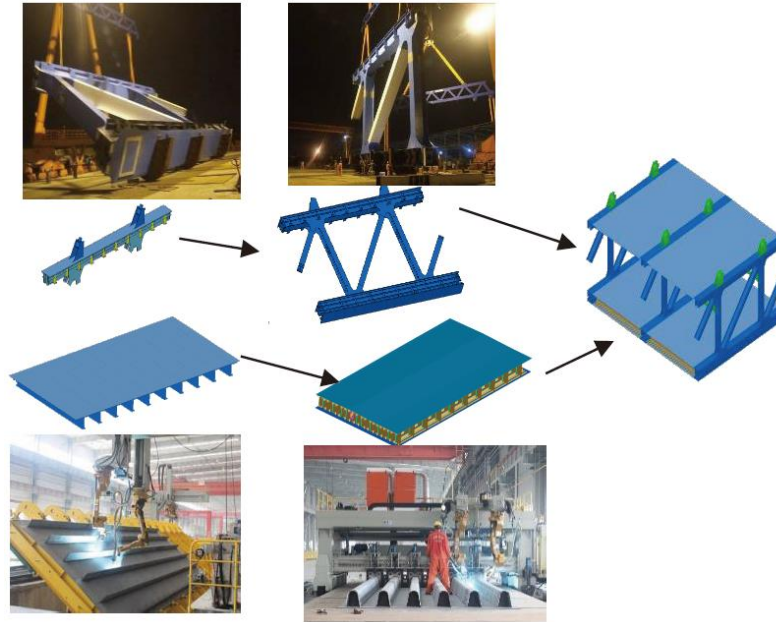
Schematic of steel girder fabrication of Hutong Yangtze River Bridge.
